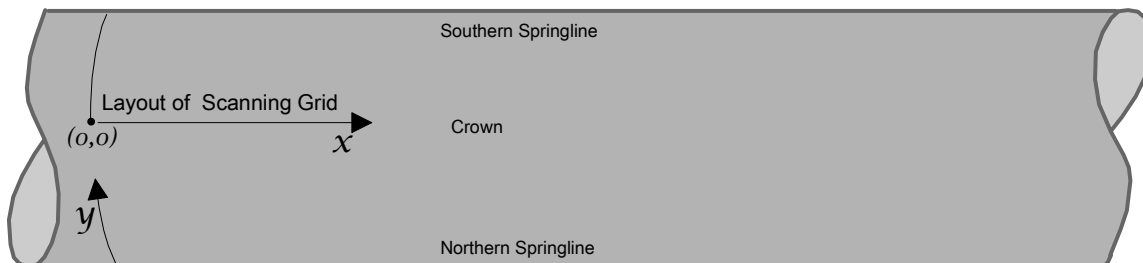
Plan View of Specific Referencing for Pipe Section Survey.
